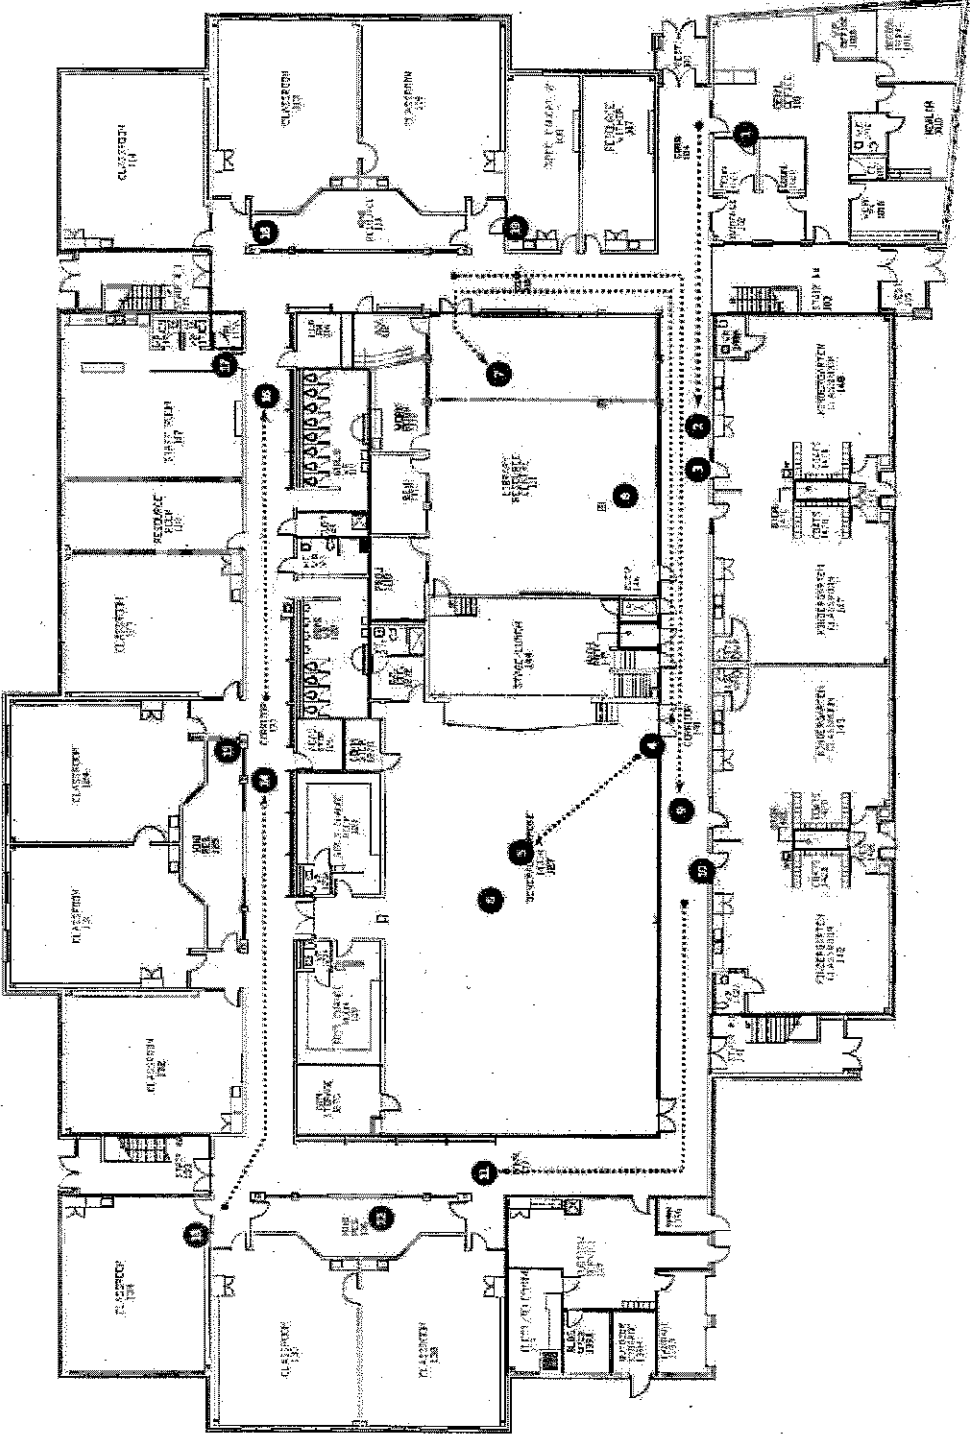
Measurement Locations, Oak Ridges Public School, Ground Floor
